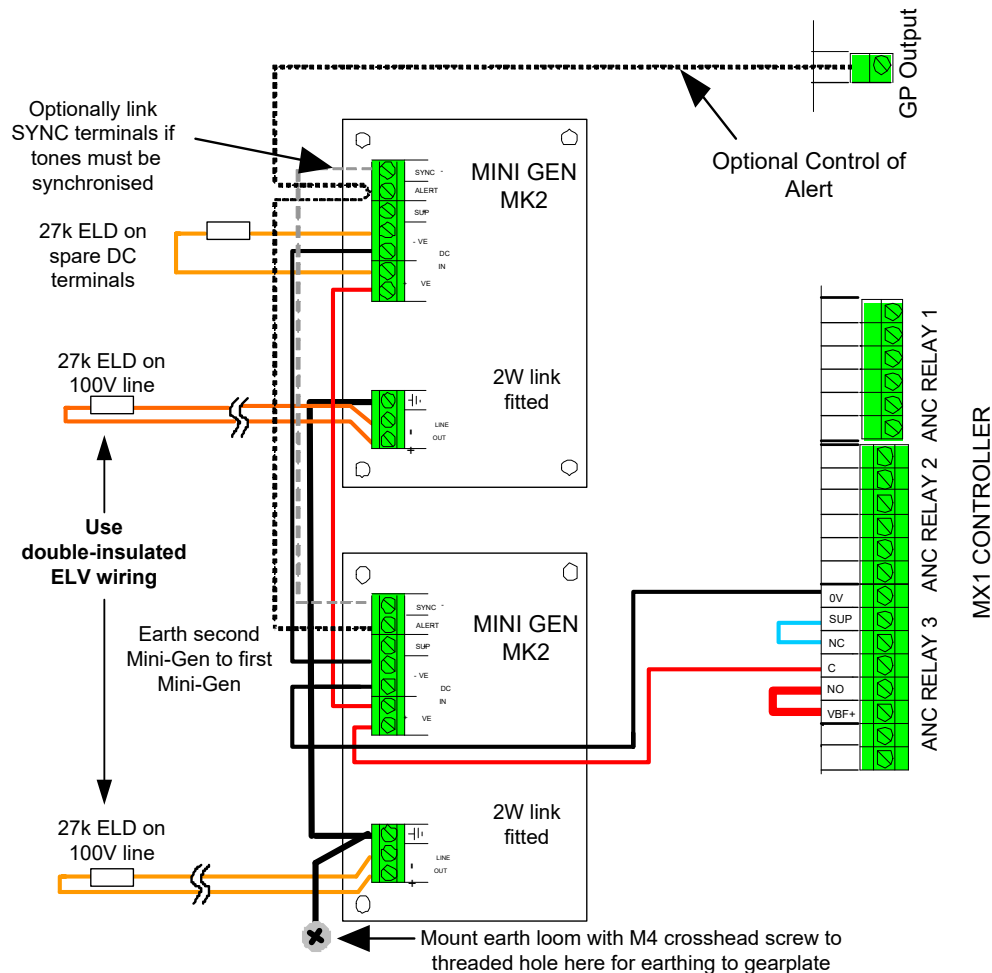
Mini-Gen Mk2 Wiring Details
